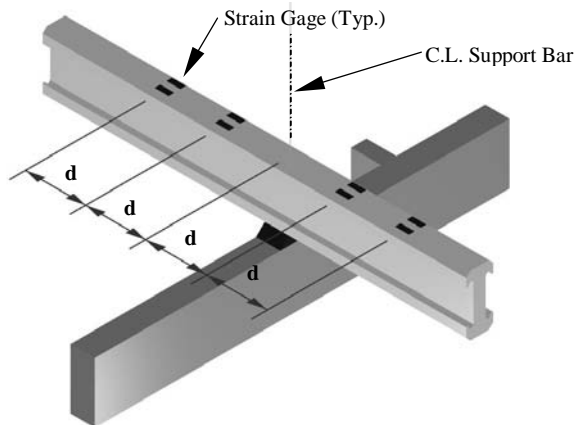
Strain-Gage Layout at Interior Centerbeam/Support-Bar Connection (Exterior Connection Similar)
